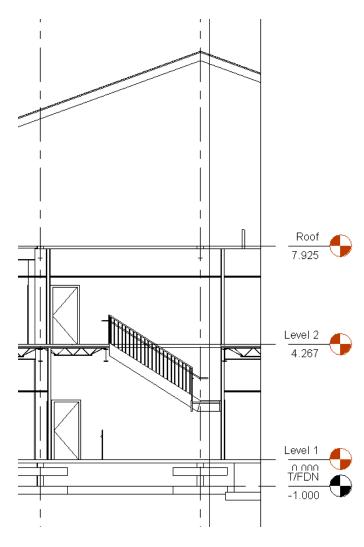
Scaled sample detailed section of a project (Standard office project Revit file from National Building Information Model Standard)
